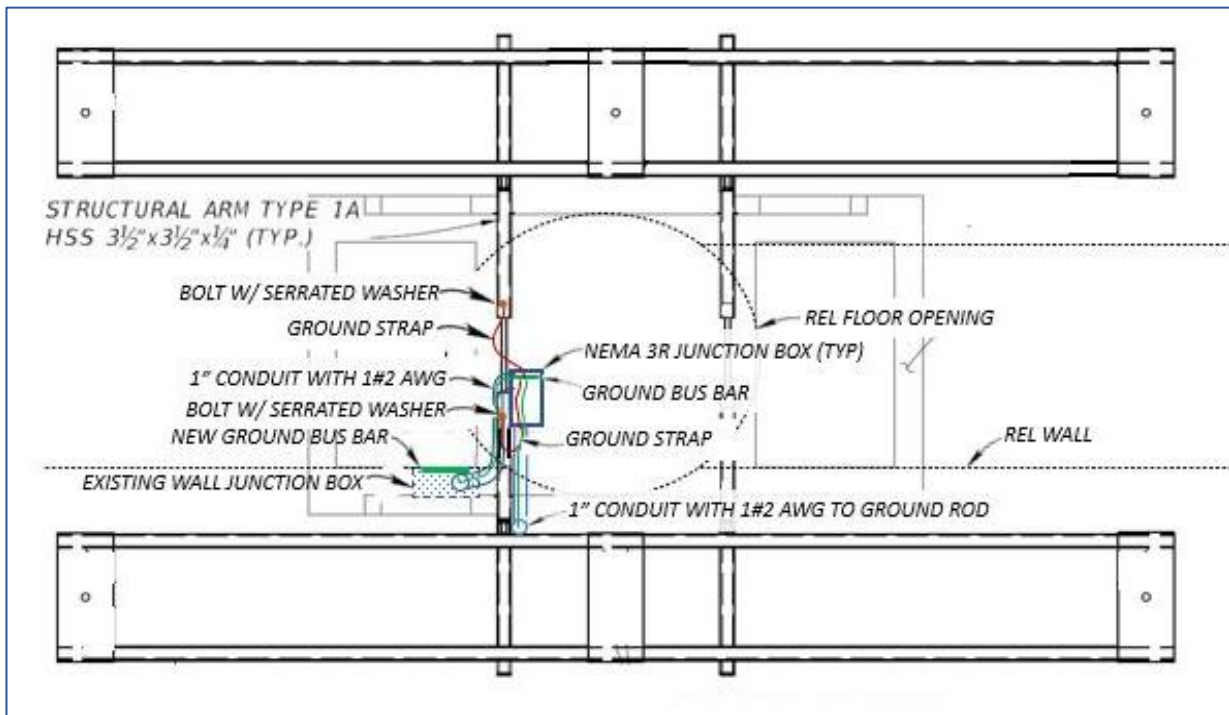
GROUND WIRE ROUTING PLAN VIEW
